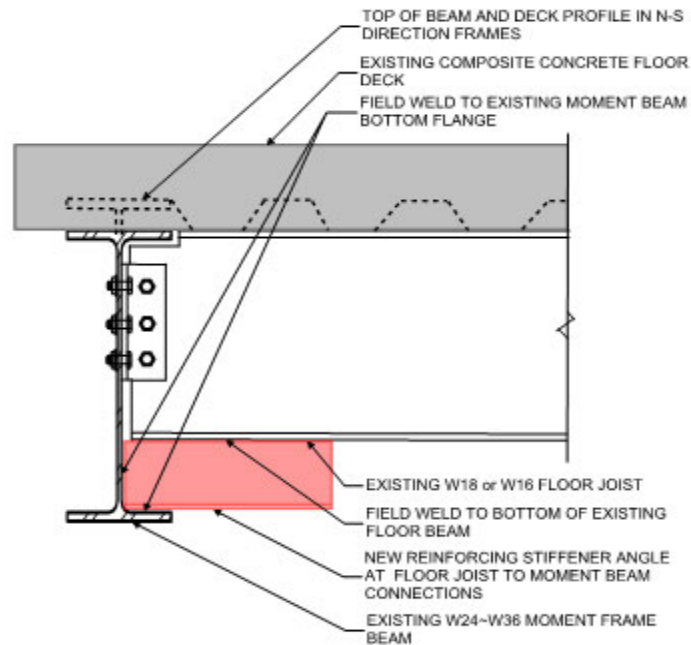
Moment Frame Beam Bracing with Stiffeners
